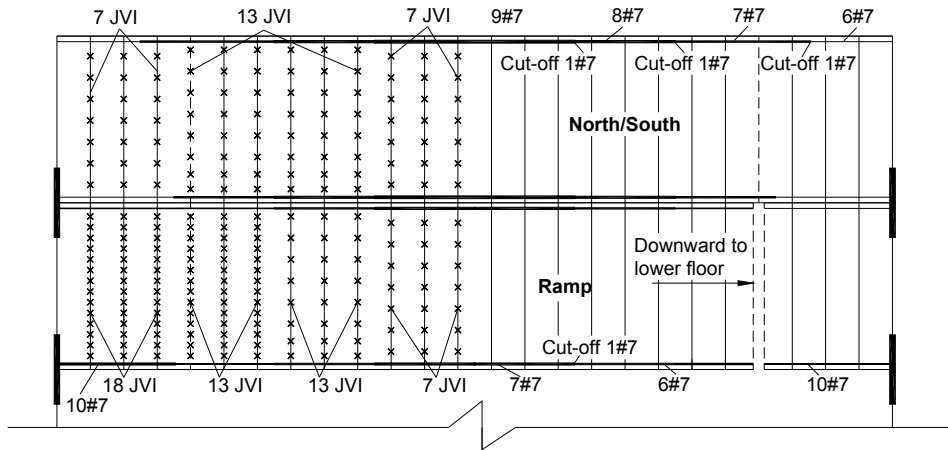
Diaphragm reinforcement at other floors for example 1A.
